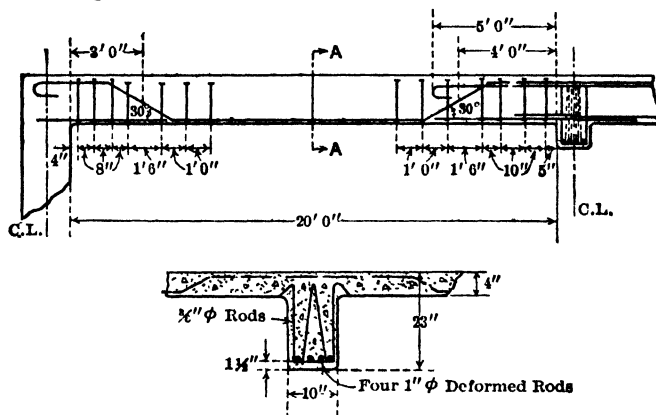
Typical Design of a Reinforced-Concrete T Beam
